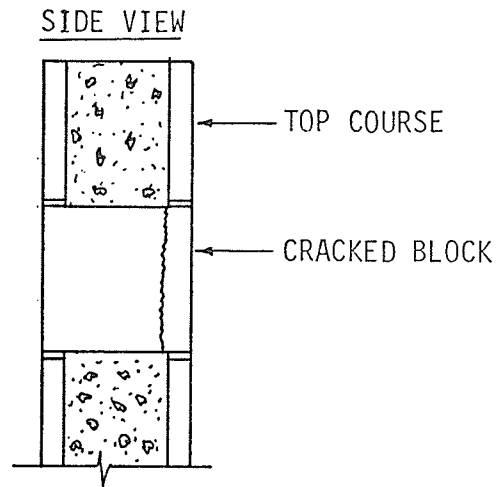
CRACKED ZONE OF WALL SECTION
